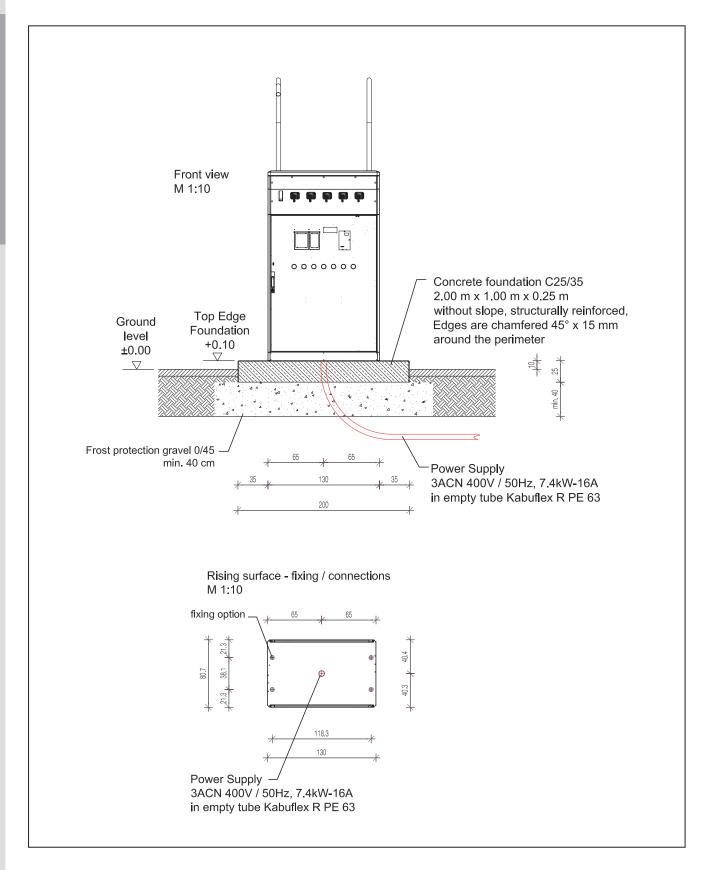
1 Dimensions for foundation, MultiTerminal front view (general example)
